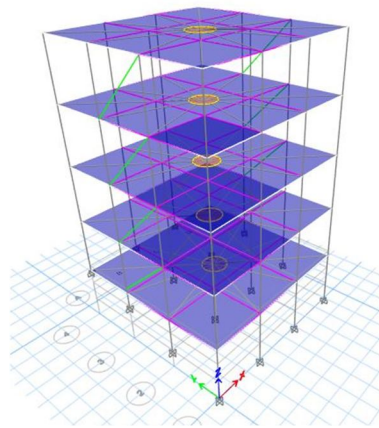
Model 5: G+4 Building With Single Diagonal Bracings at 20⁰ Slope
